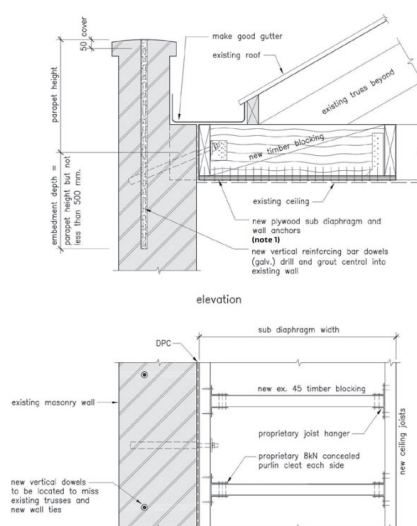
Post installed epoxied or grouted dowels parapet retrofit
